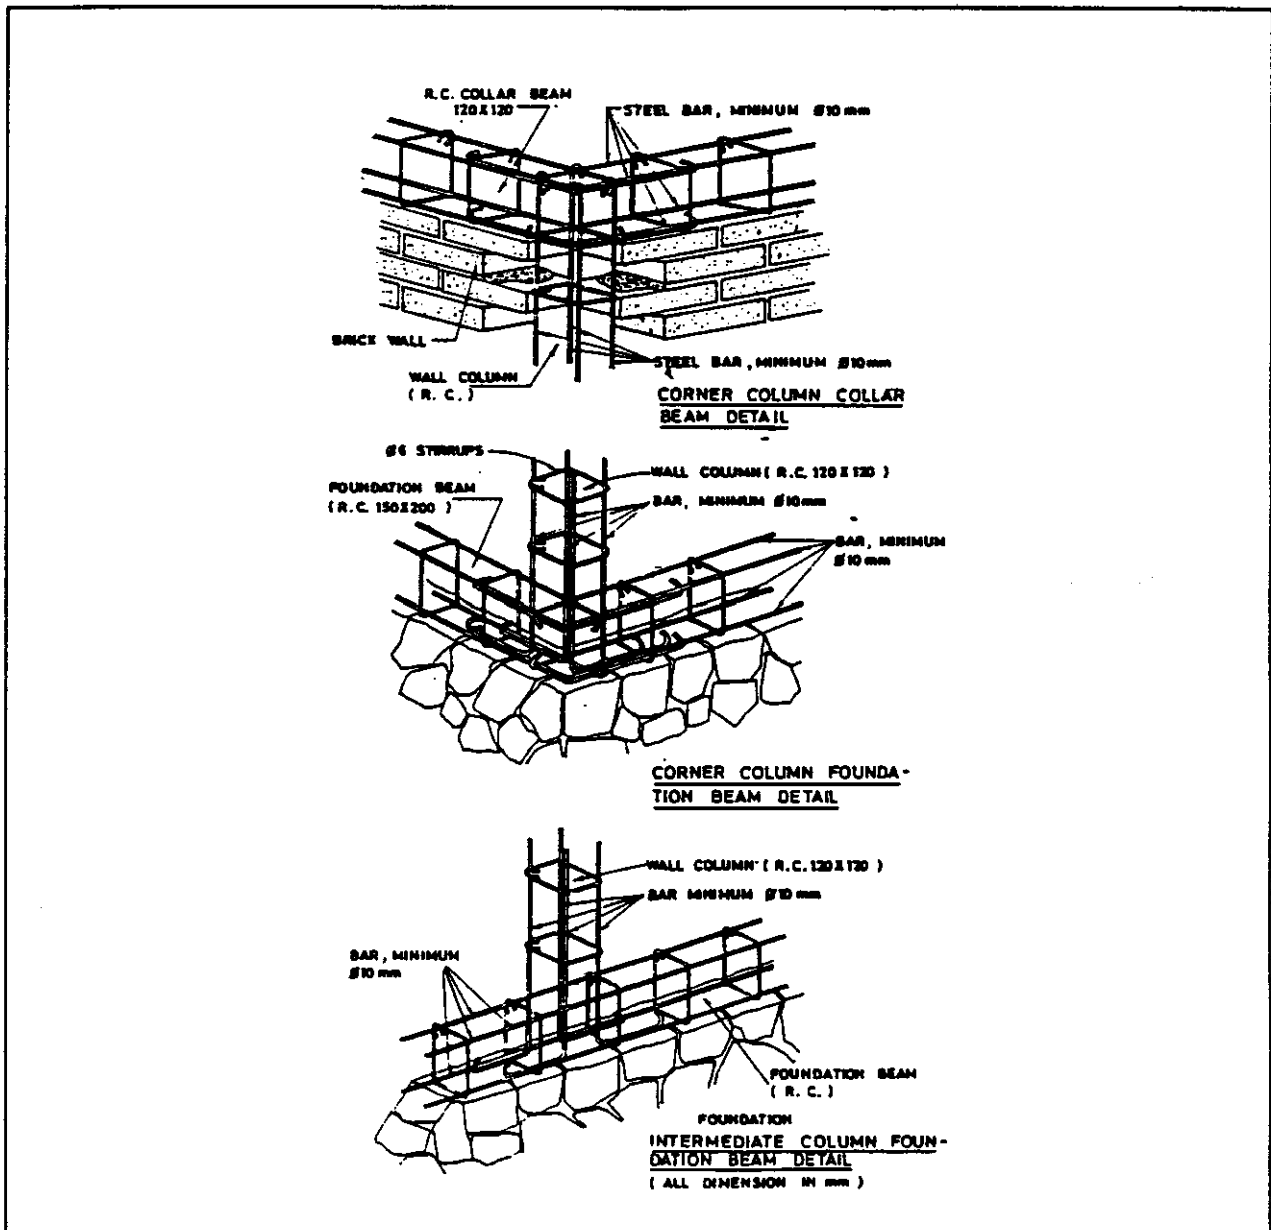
Typical Reinforcing Details of Thin Wall Masonry [1]
